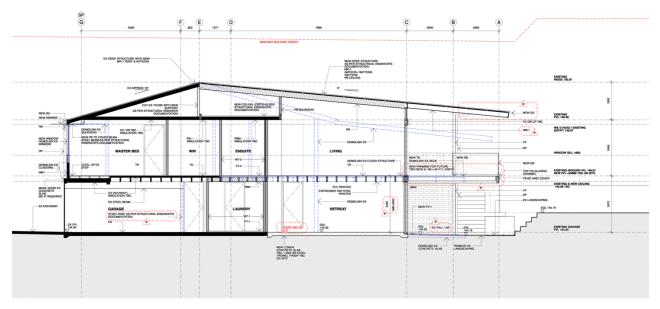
CDC Section DD 11 Jones Street, Beacon Hill
